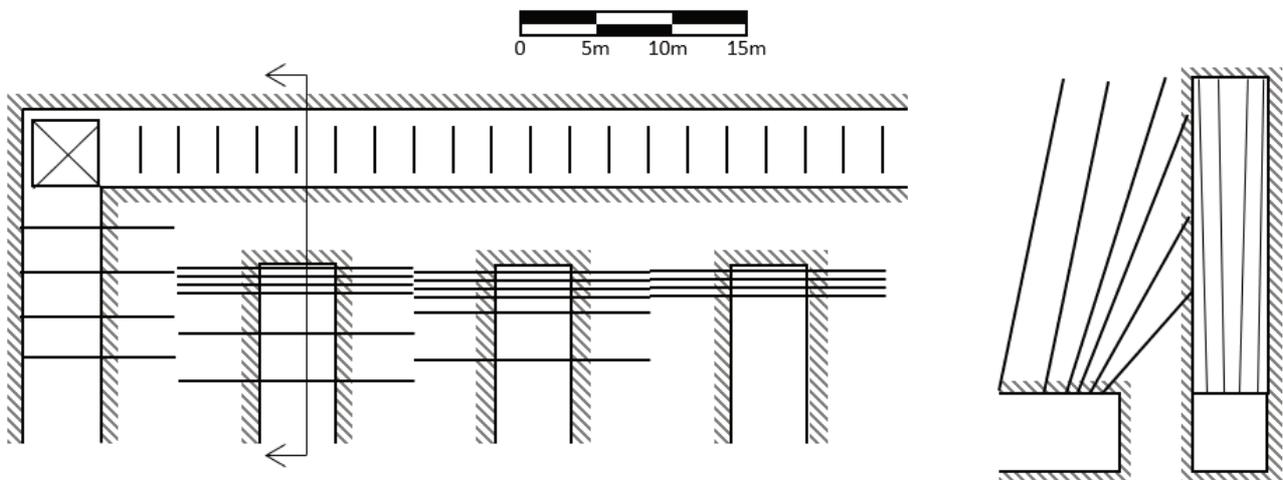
Layout of slot drift, non-breakthrough plan view and section view
